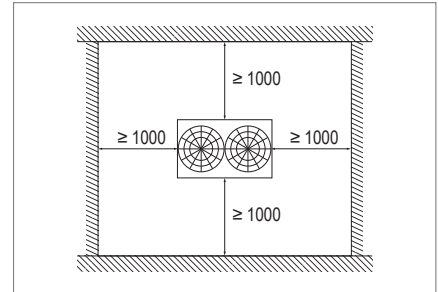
Minimum distances for the heat pump P (dimensions in mm)
